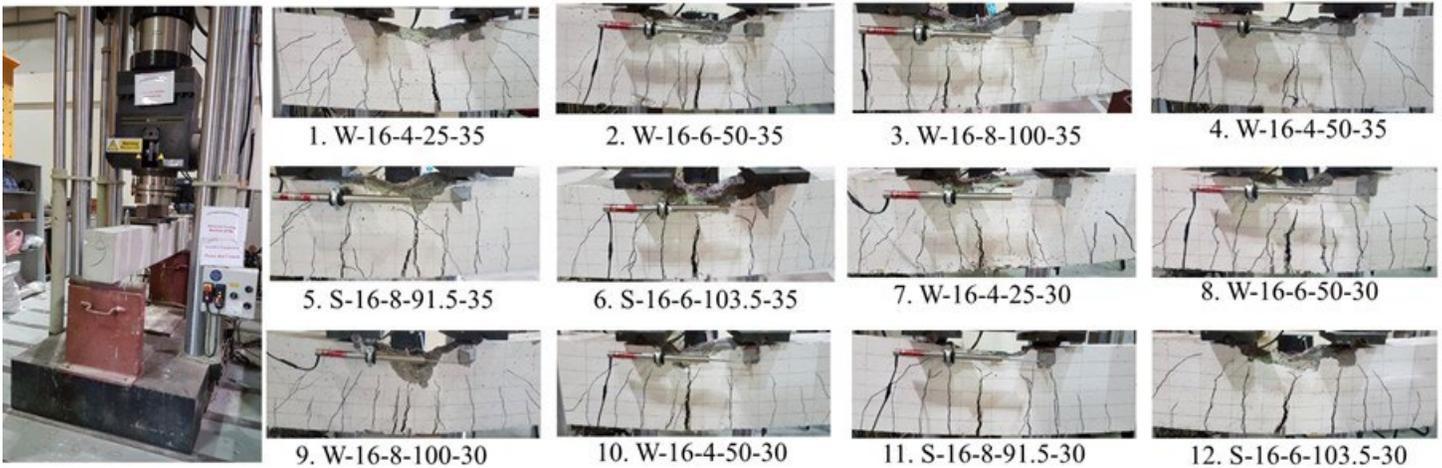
Test setup and cracking pattern for all 12 tested concrete beams.
